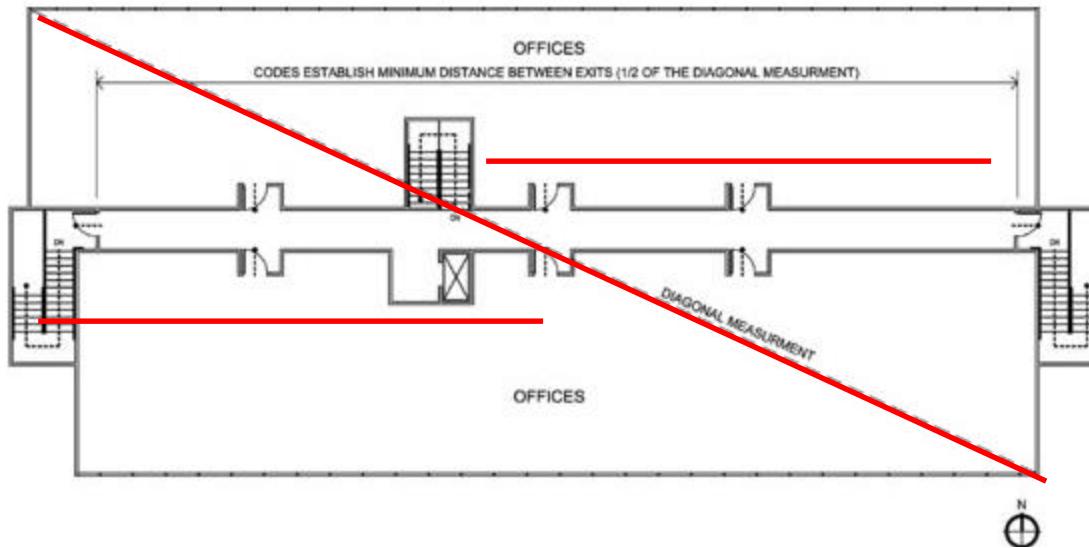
p.15 SECOND LEVEL FLOOR PLAN
